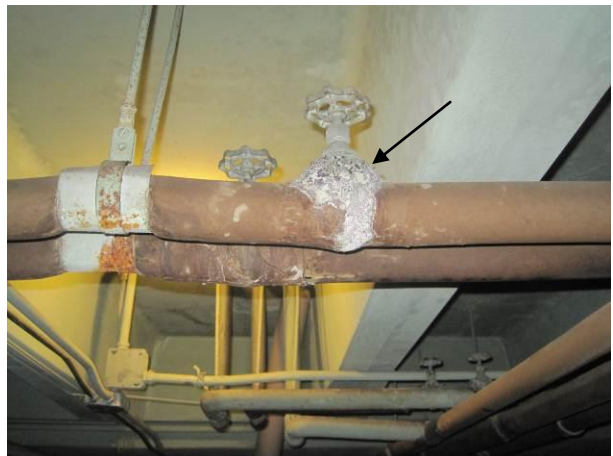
Asbestos-containing Thermal Fitting Insulation (White) Associated with Foam Pipe Insulation.
